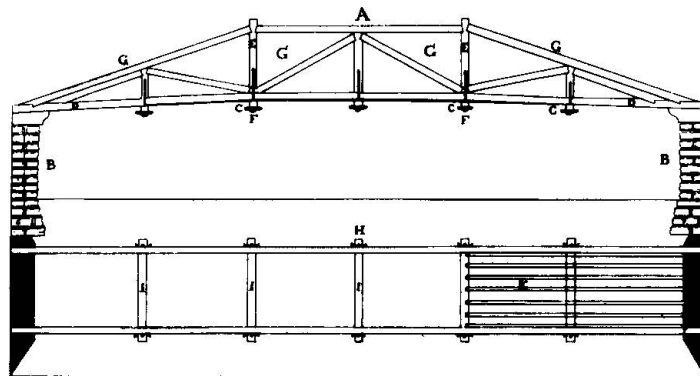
Andrea Palladio's bridge over the River Cimone, with a span of about 30 m that was large for the 16th century. In his *Four Books of Architecture* (Ref. 2 p. 65) he explains the structure:- "A, The flank of the Bridge. B, The pilasters that are on the banks. C, The heads of the beams that form the breadth. D, The beams that form the sides. E, The colonelli, F, The heads of the cramps, with the iron bolts. G. are the arms, which bearing contrary to each other, support the whole work..." Evidently Palladio recognized the importance of the diagonal members.
